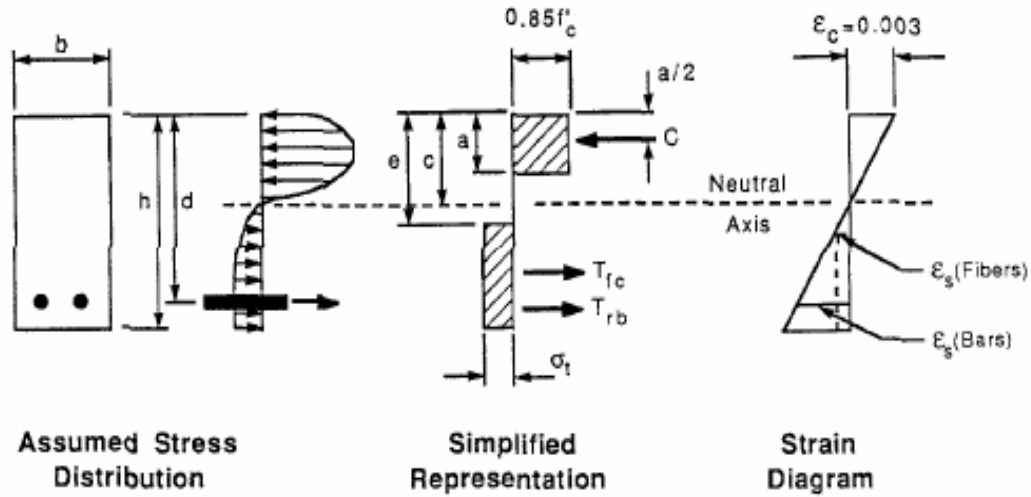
20: Design assumptions of singly reinforced concrete beams containing steel fibres from [9]
